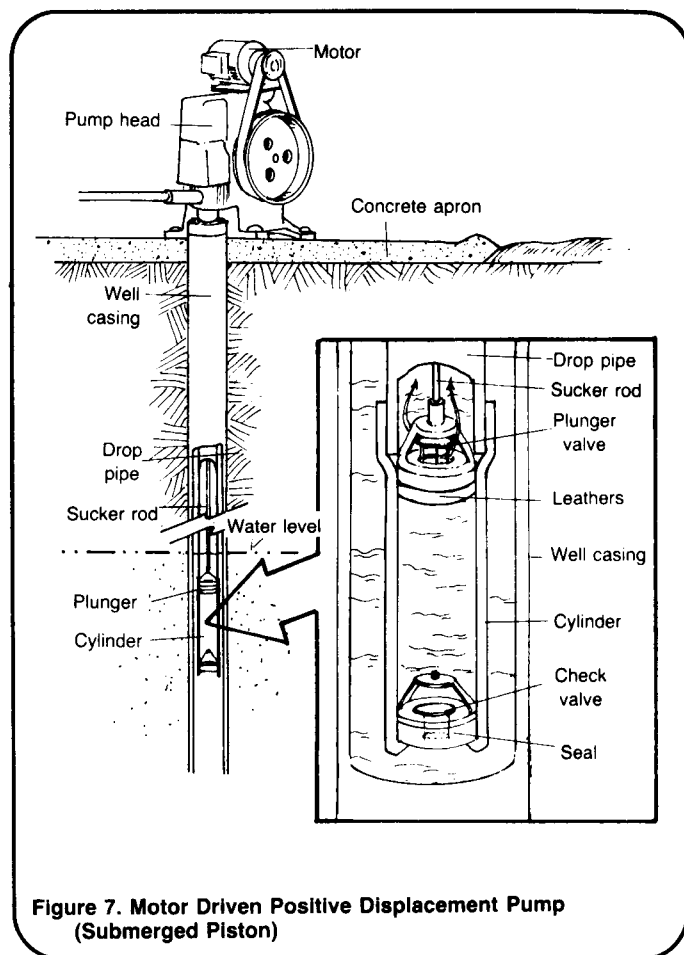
Motor Driven Positive Displacement Pump (Submerged Piston)
